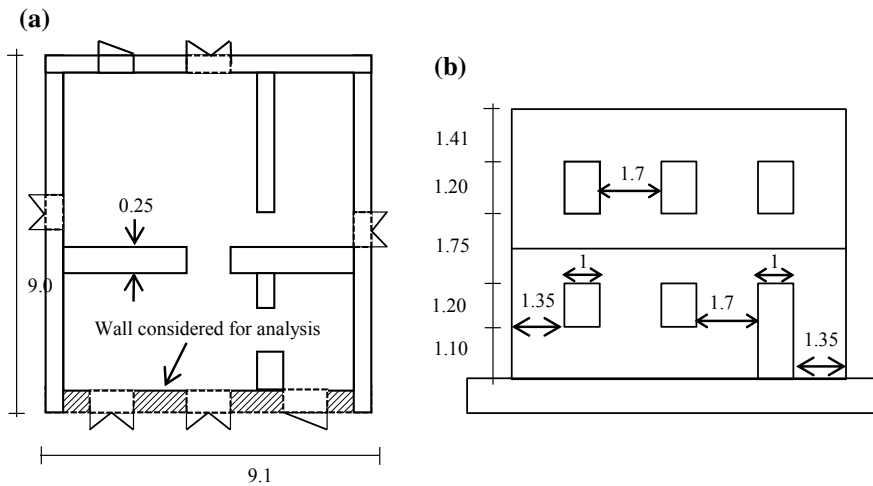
a Plan and b Elevation of masonry wall (All dimensions are in metre)
